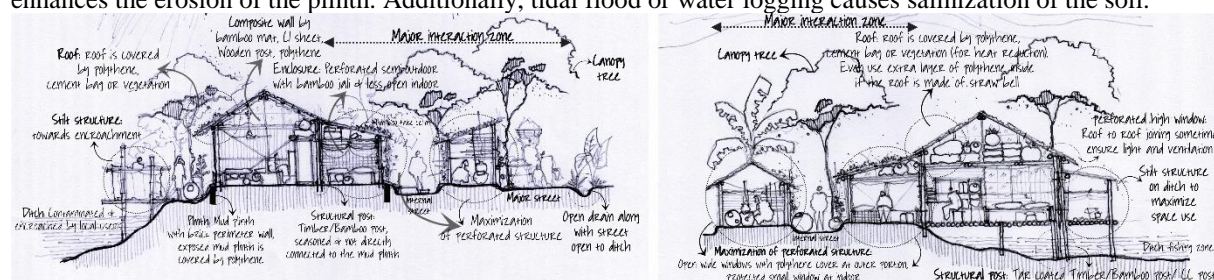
Construction materials and techniques of a mud plinth (left) and a stilt type (right) dwelling unit (source: author)
